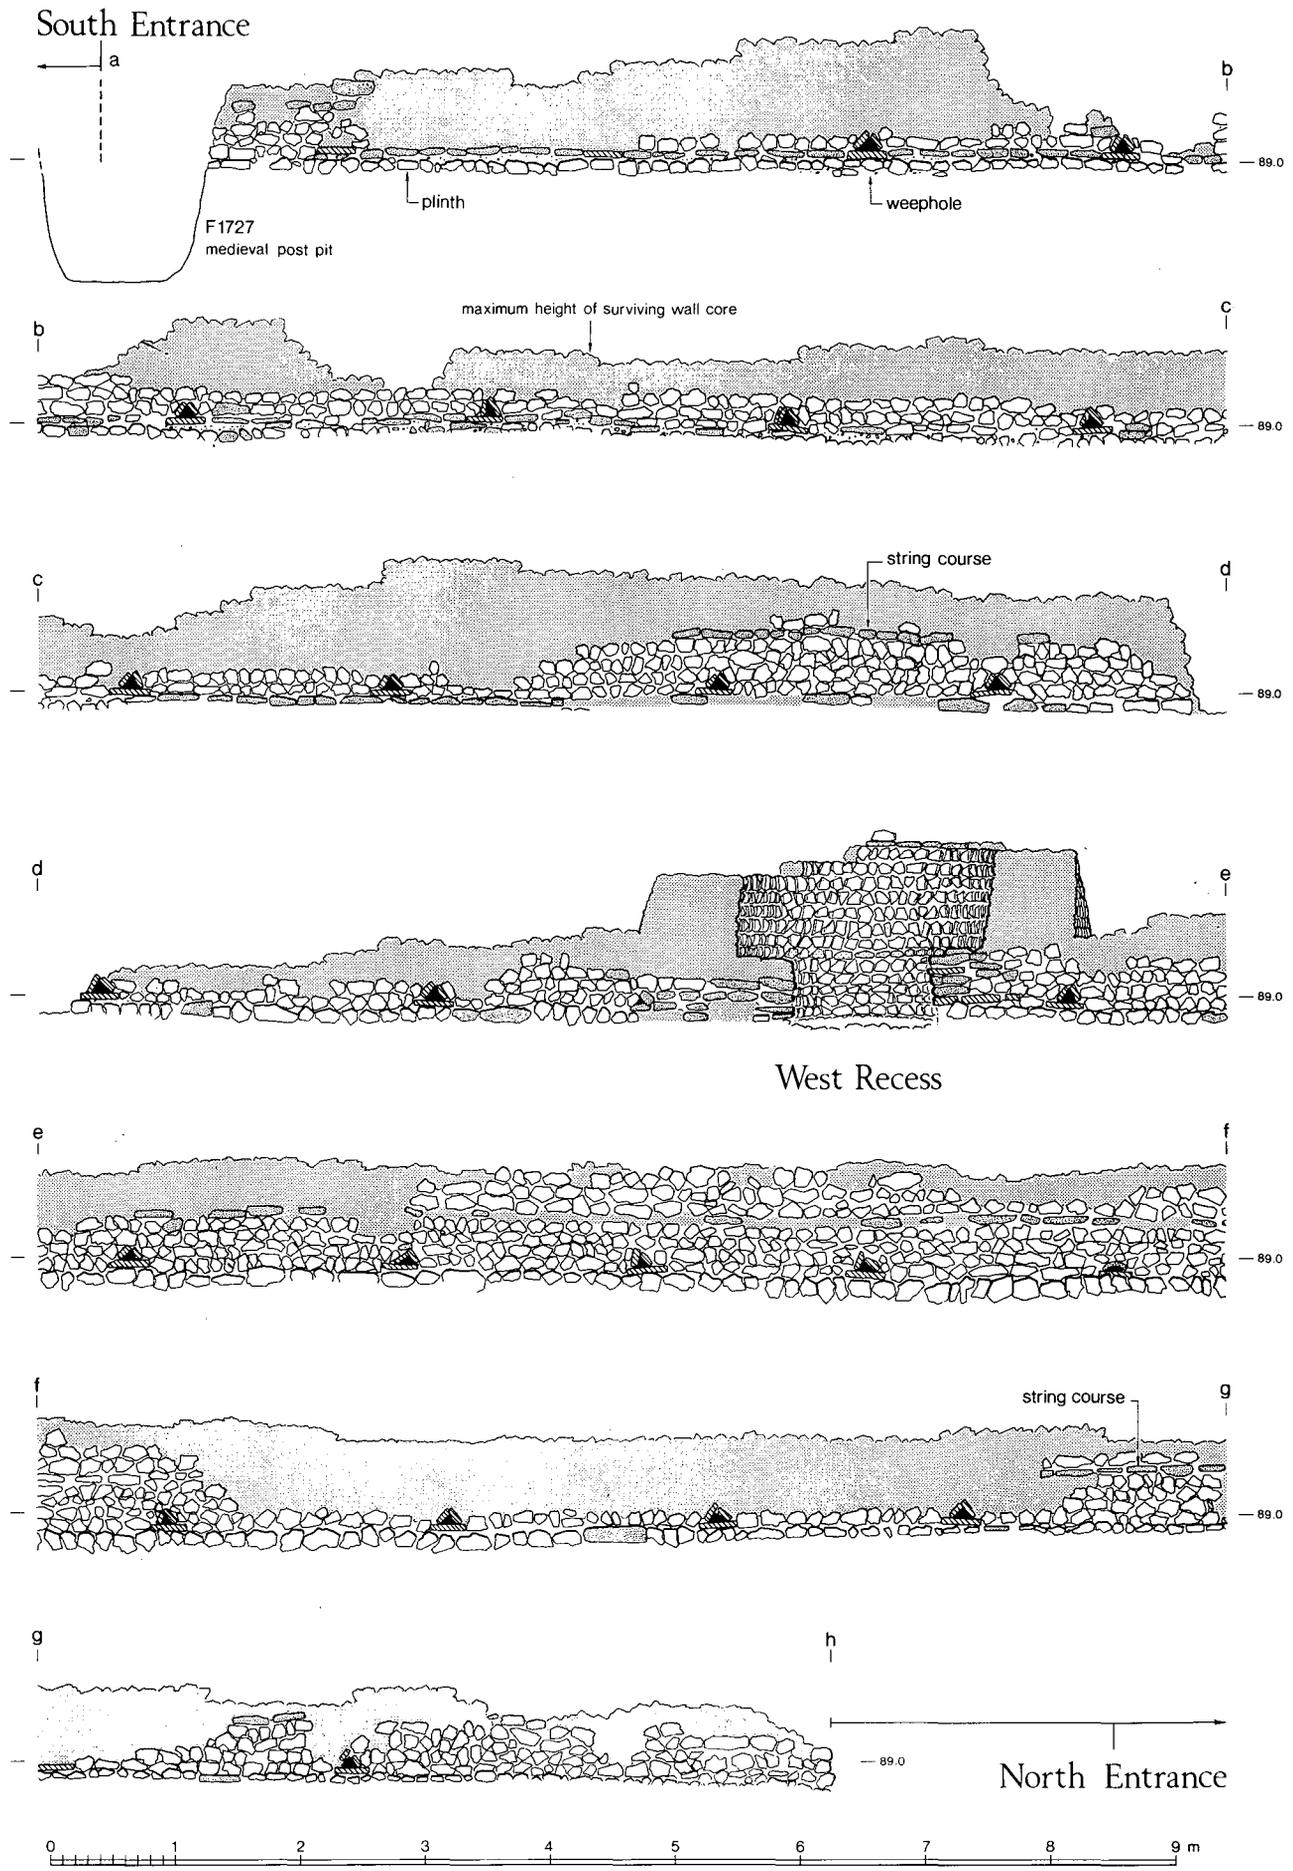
Arena wall: elevation of west side (Scale, 1:60).
